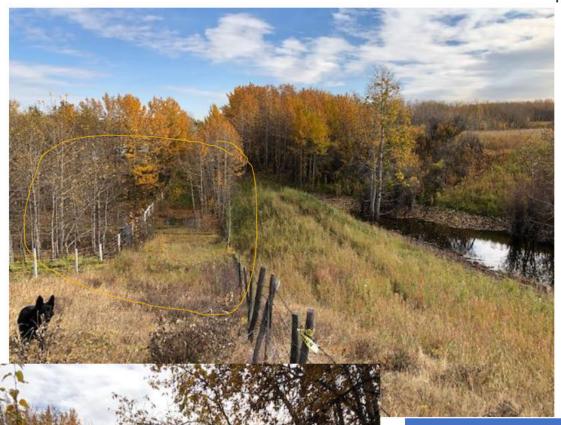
FACING SILVERHORN DAM FROM HANSEN'S LAND
